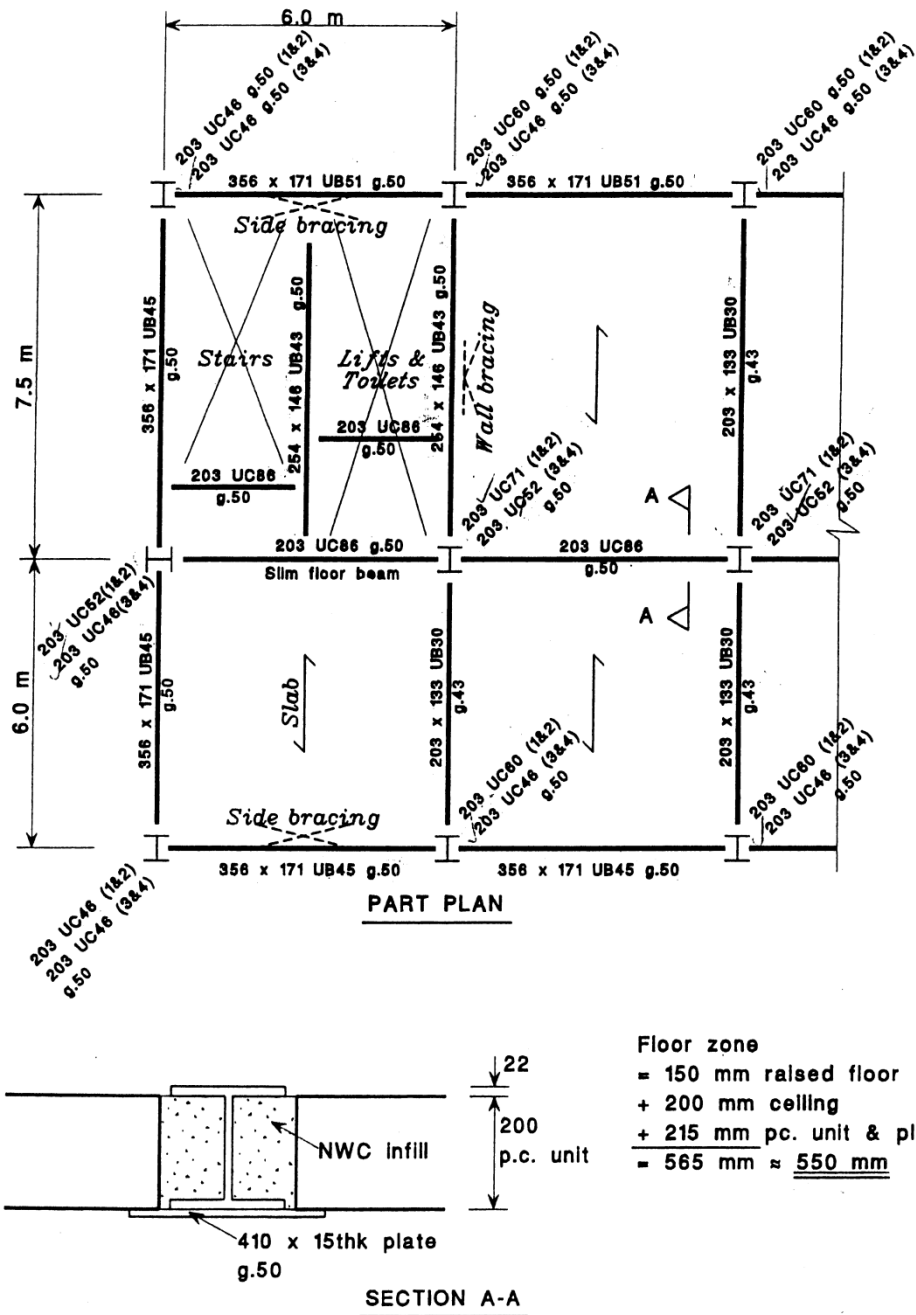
Slimflor® beams with pre-cast slab (SCI 2004)
